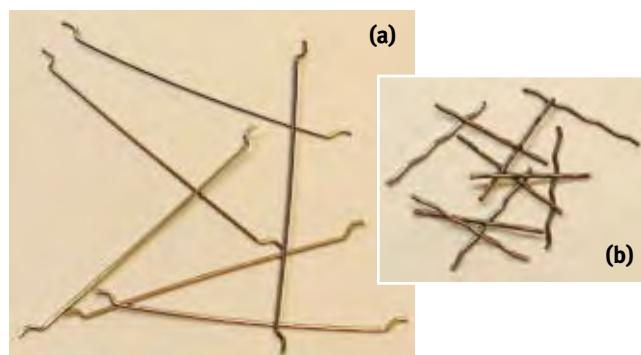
Typical deformed steel fibers: (a) hooked fibers; and (b) crimped fibers
